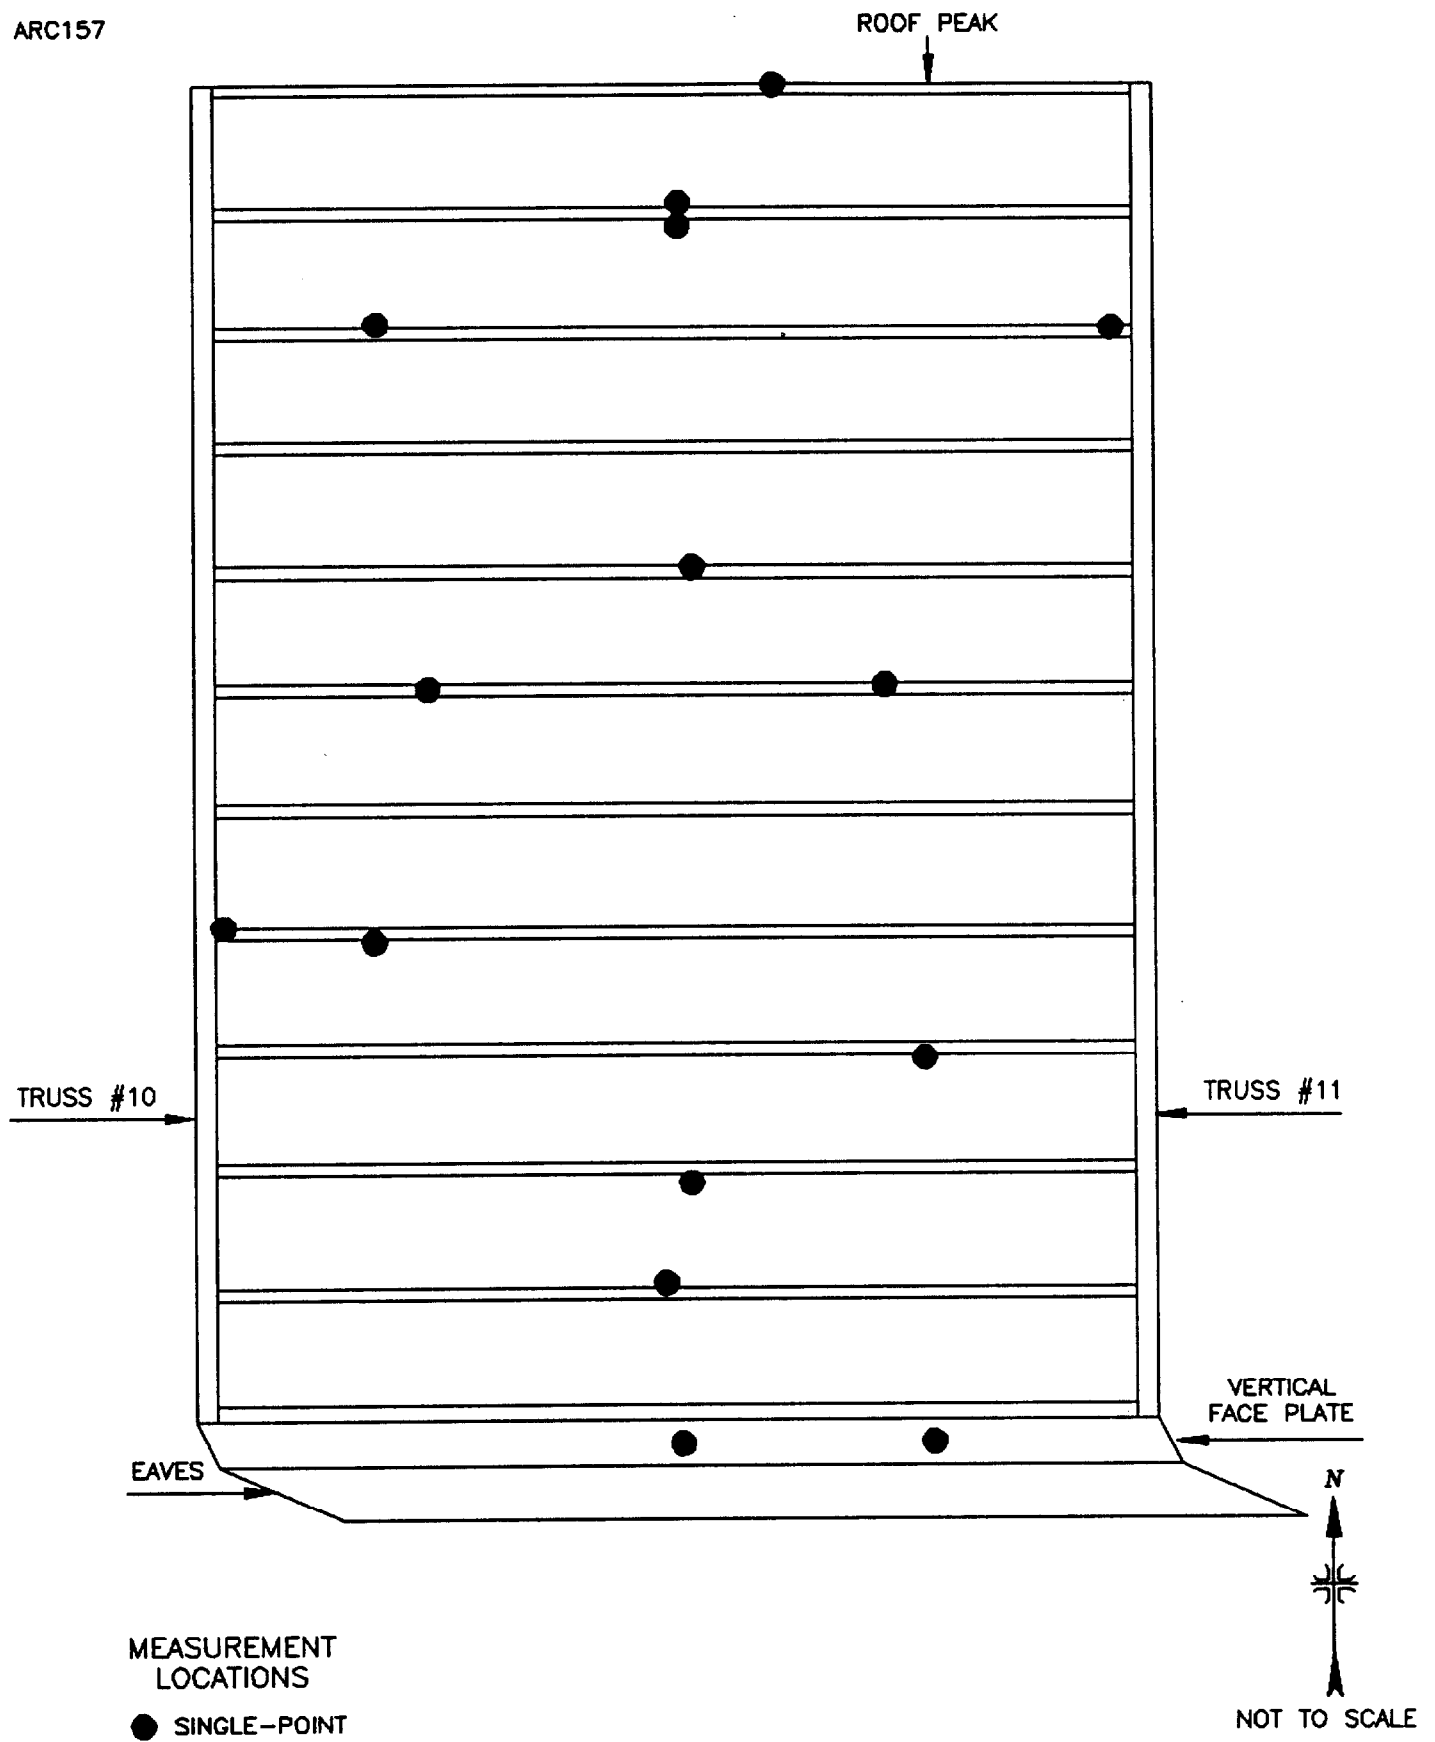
Building 17 Attic Ceiling Supports, Area #8 – Measurement Locations
